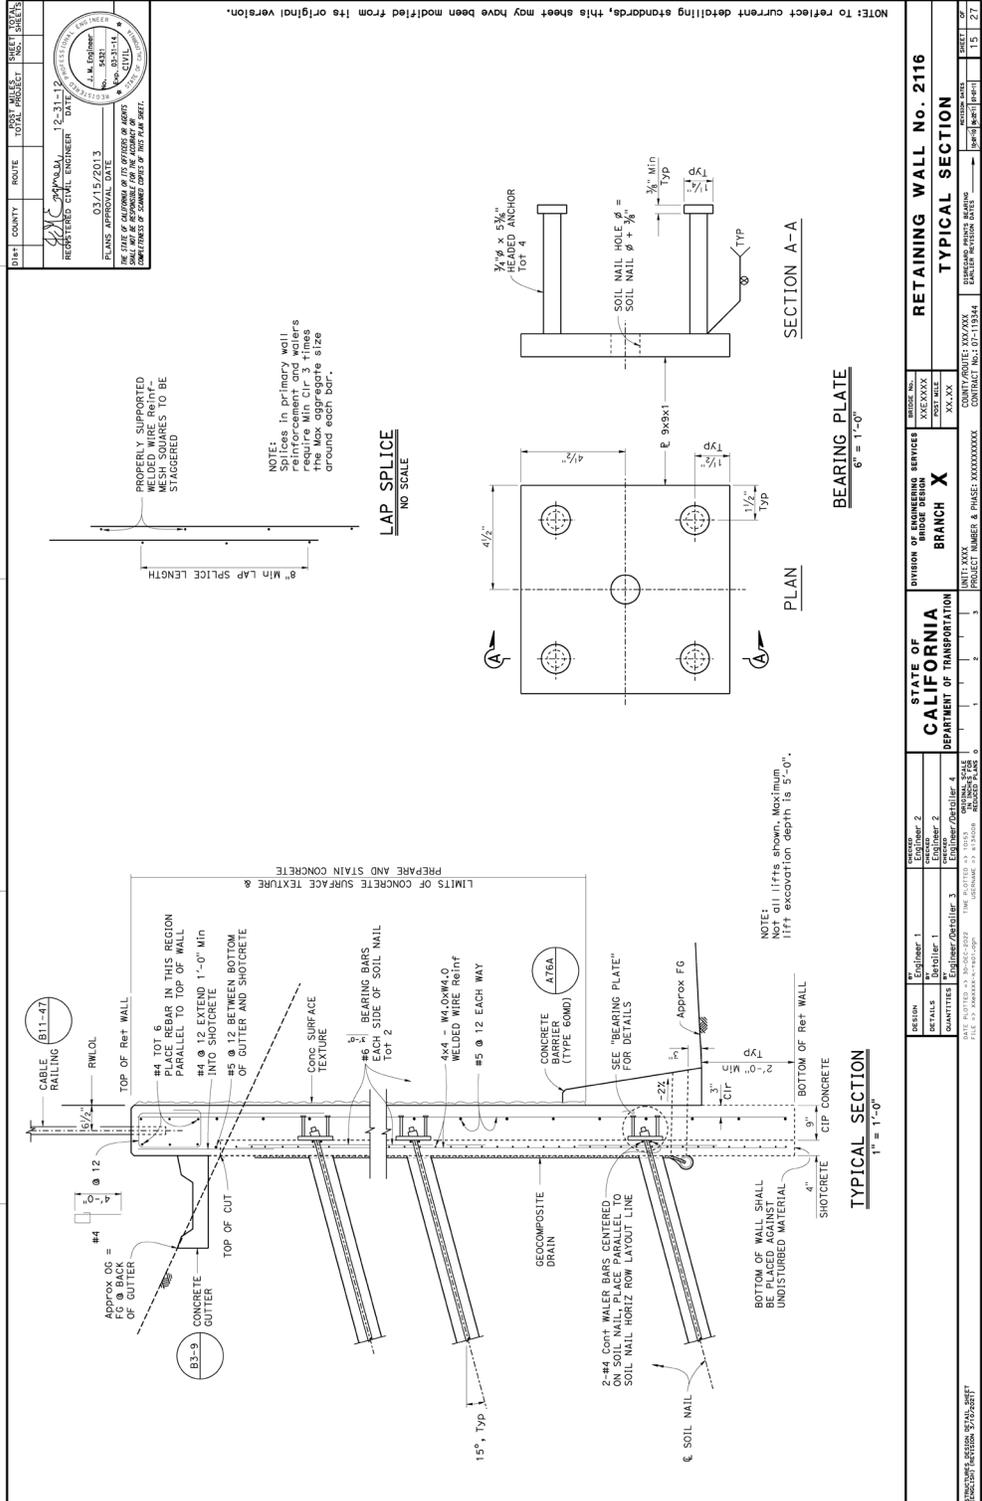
A.B.7 Soil Nail Wall Detailing Example 7
